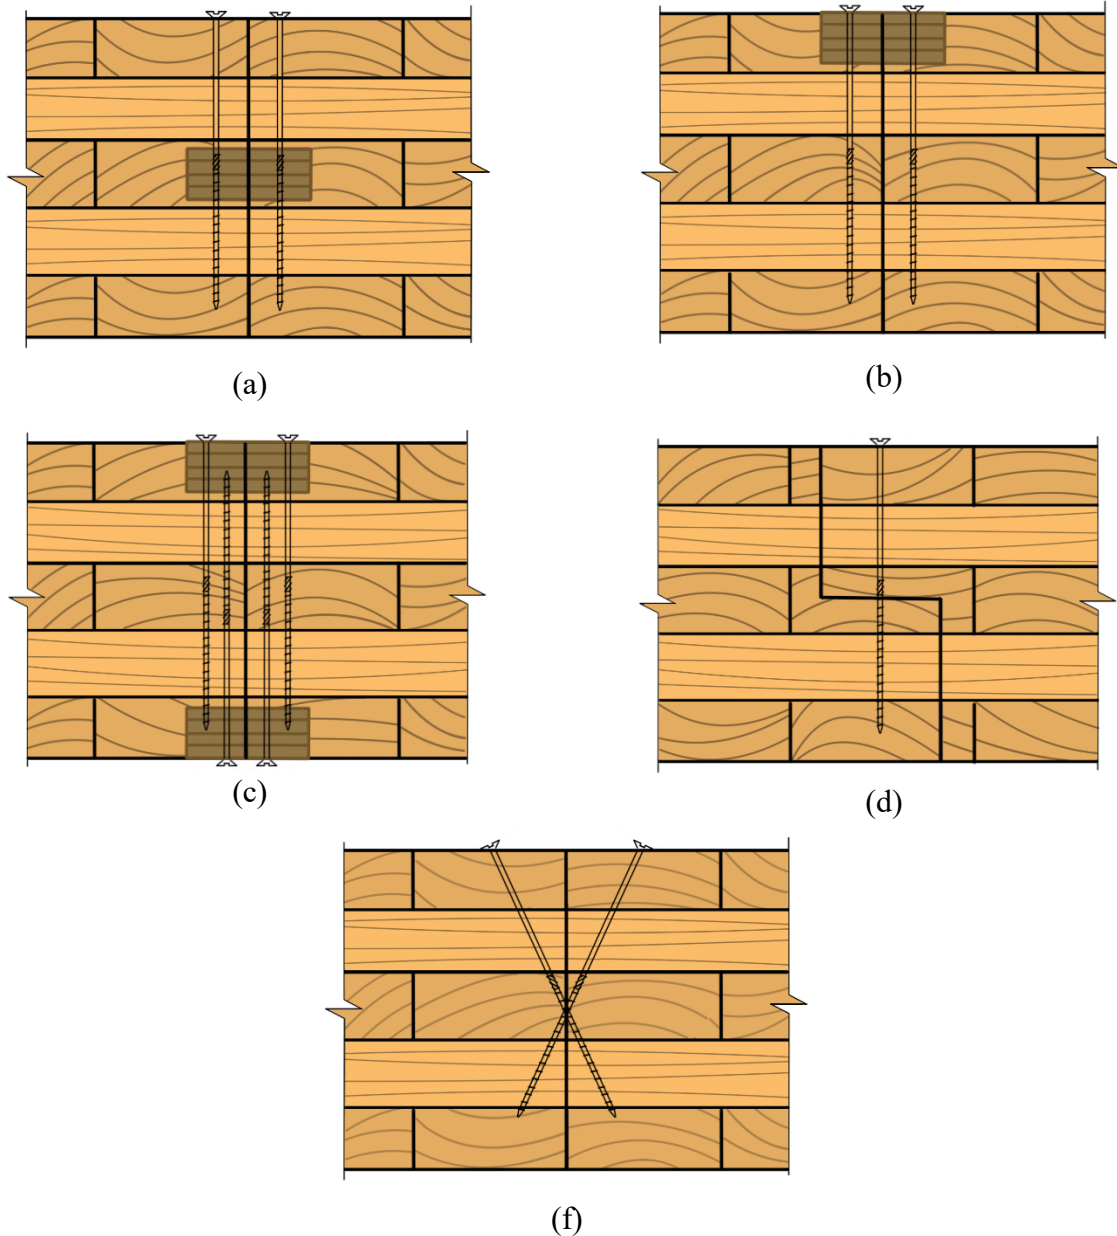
Conventional CLT panel-to-panel connections: a) internal spline, b) single surface spline, c) double surface spline and d) half-lapped joints, f) inclined butt joint
